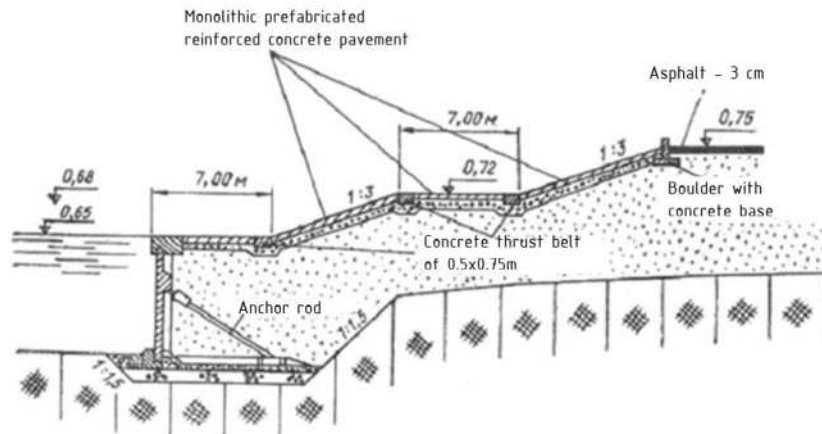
Fastening of the shore embankment with the use of concrete slabs
